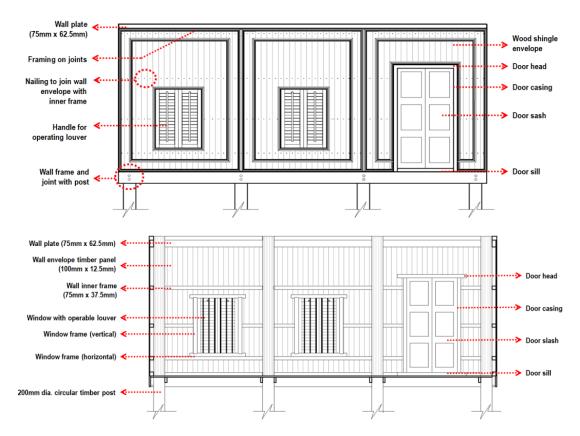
Wall and fenestration of Stilt timber house: exterior view (top) and interior view (bottom)
